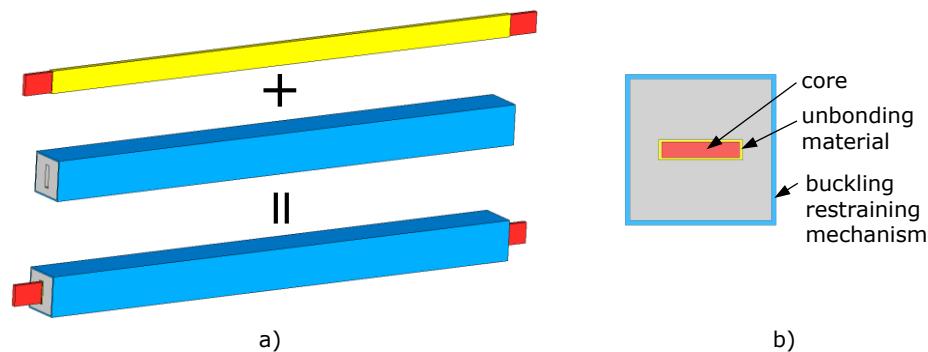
The simplest conceptual BRB design: a) perspective view, b) cross-section
